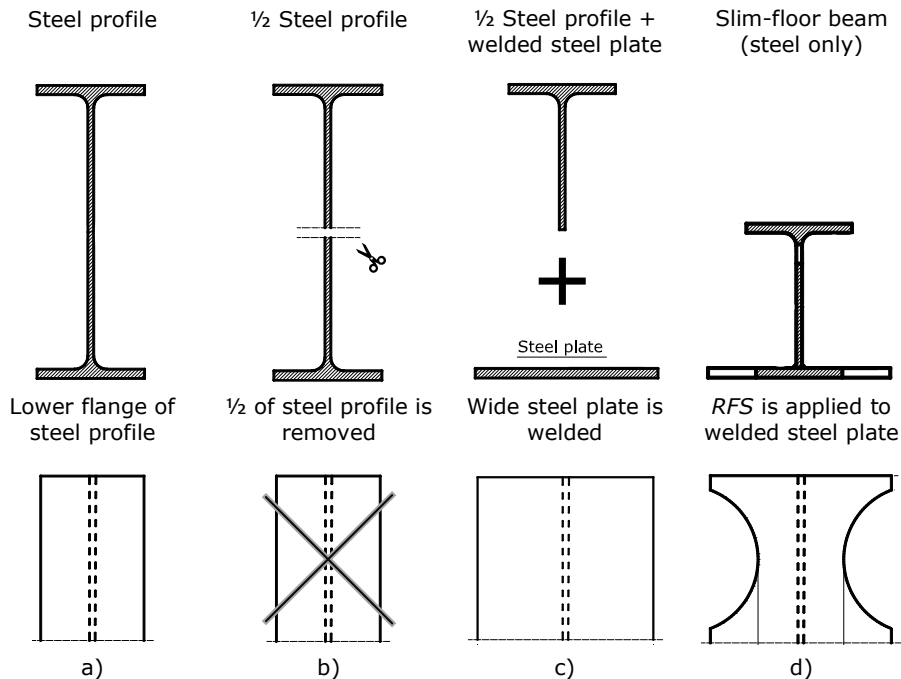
Development of slim-floor beam: a) initial steel profile [7]; b) removal of 1/2 steel profile [7]; c) welding of wide steel plate [7]; d) application of *RFS* to lower steel plate
